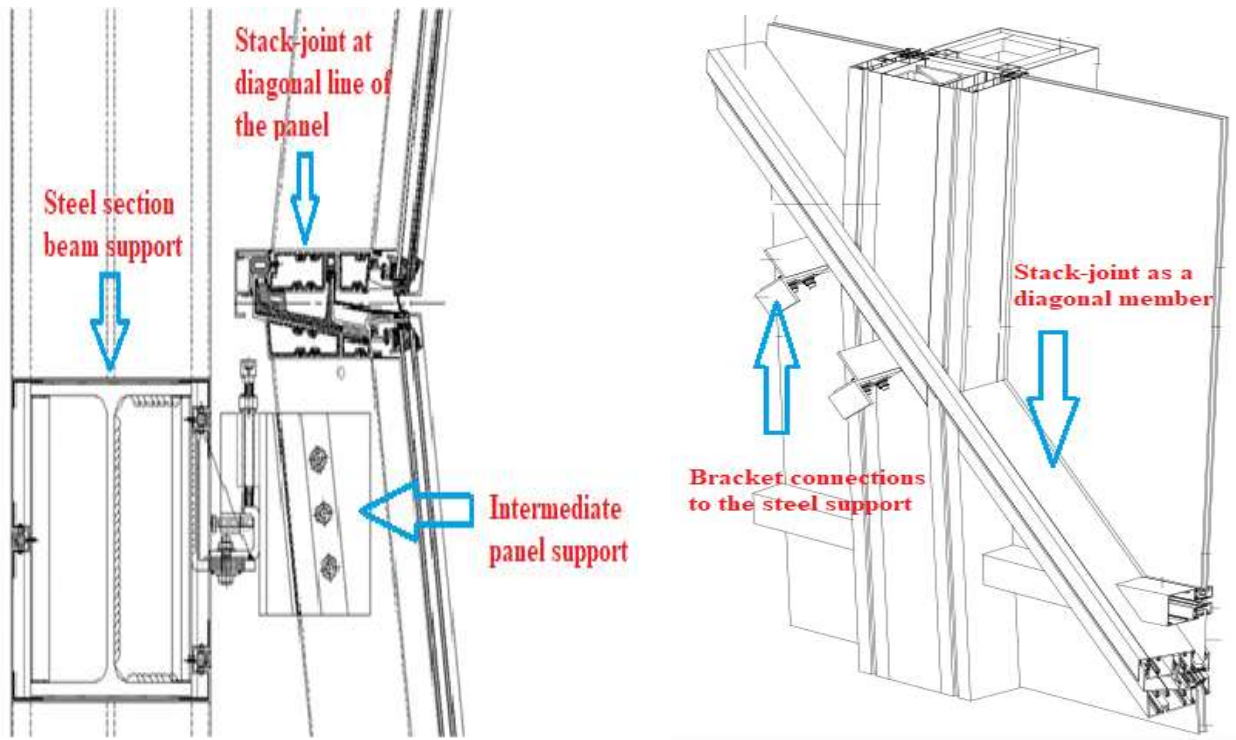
Steel beam supported unitized curtain wall proposal section drawing
